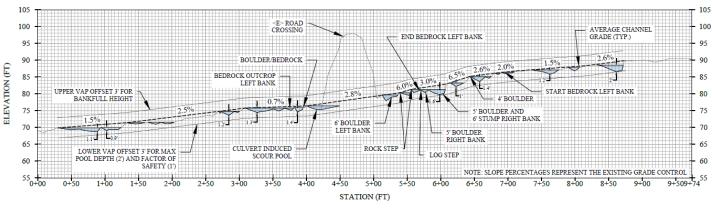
Existing Culvert Alignment (Appendix A, Sheet 3)
